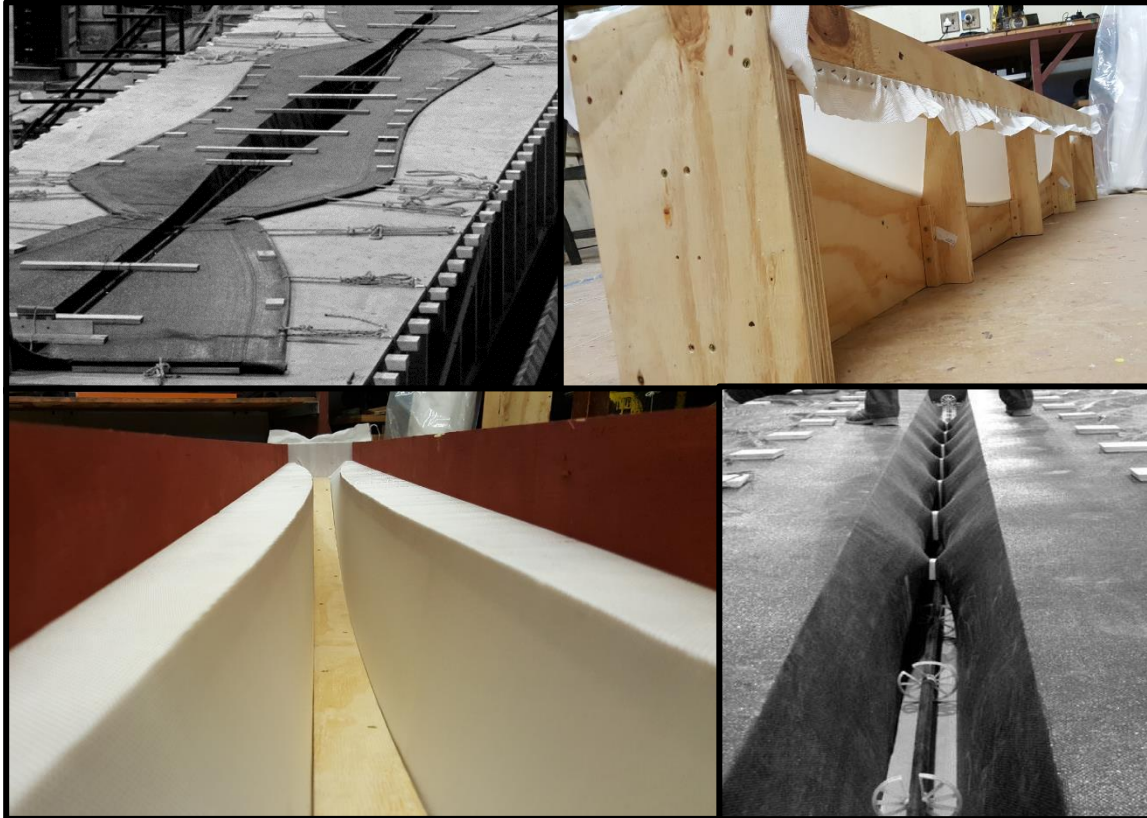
Beam moulds consisting of Fabric formwork combined with pressed wood (West, 2016).
